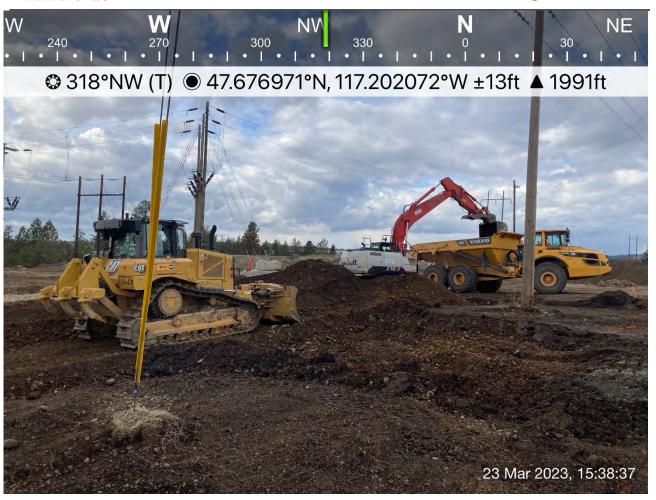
CAT D6 dozer uses to push backfill material delivered to site.
